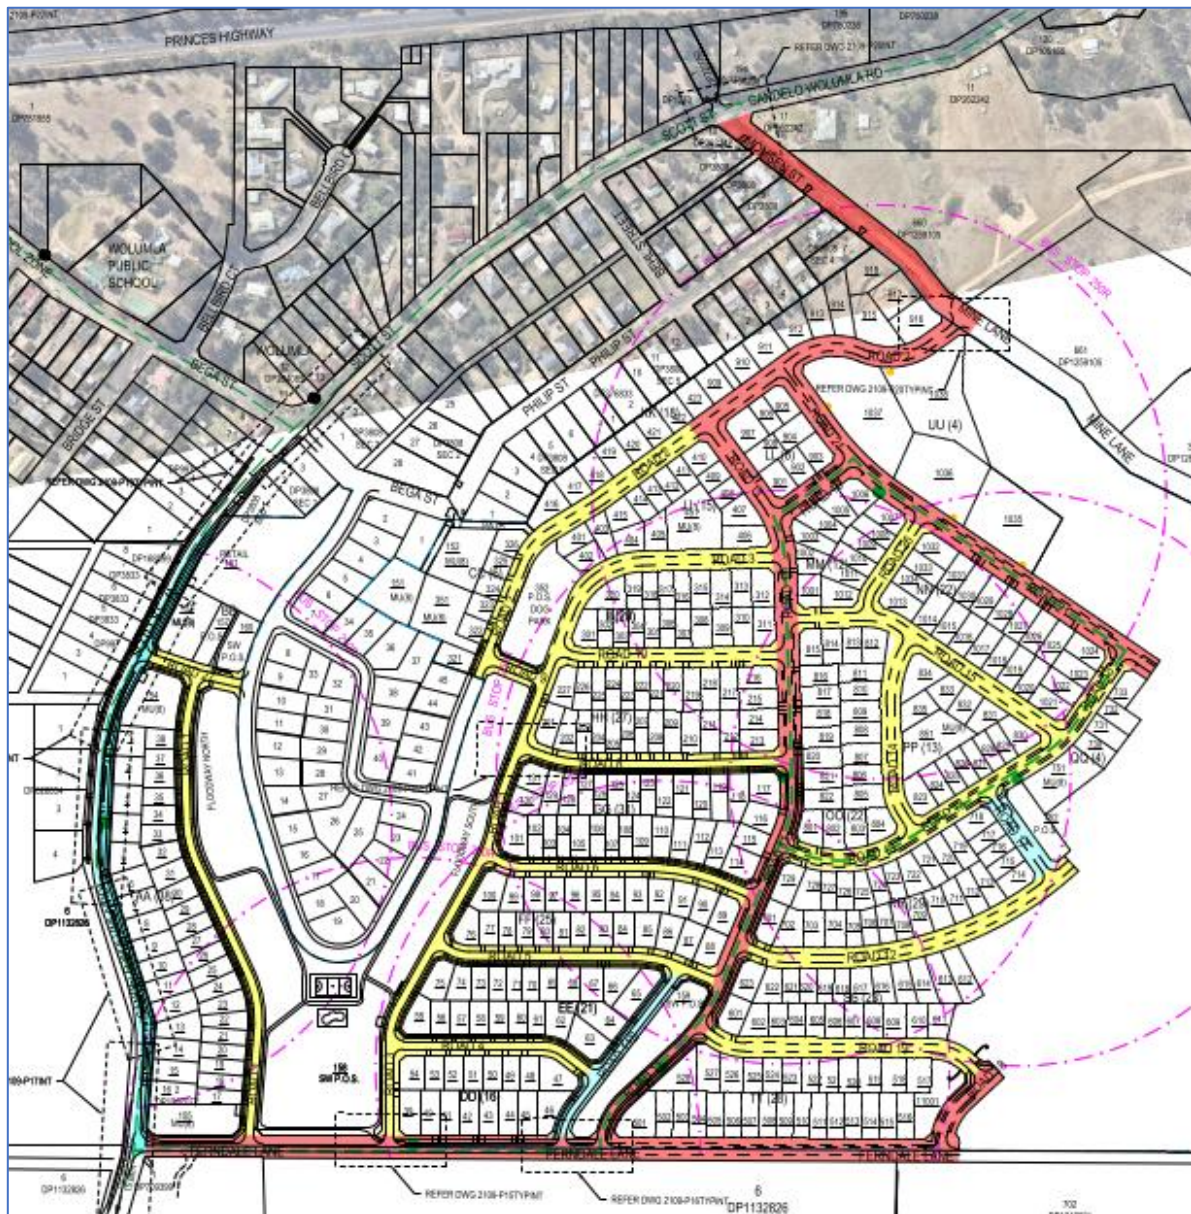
Proposed Road Hierarchy Plan Stage 1 Subdivision
